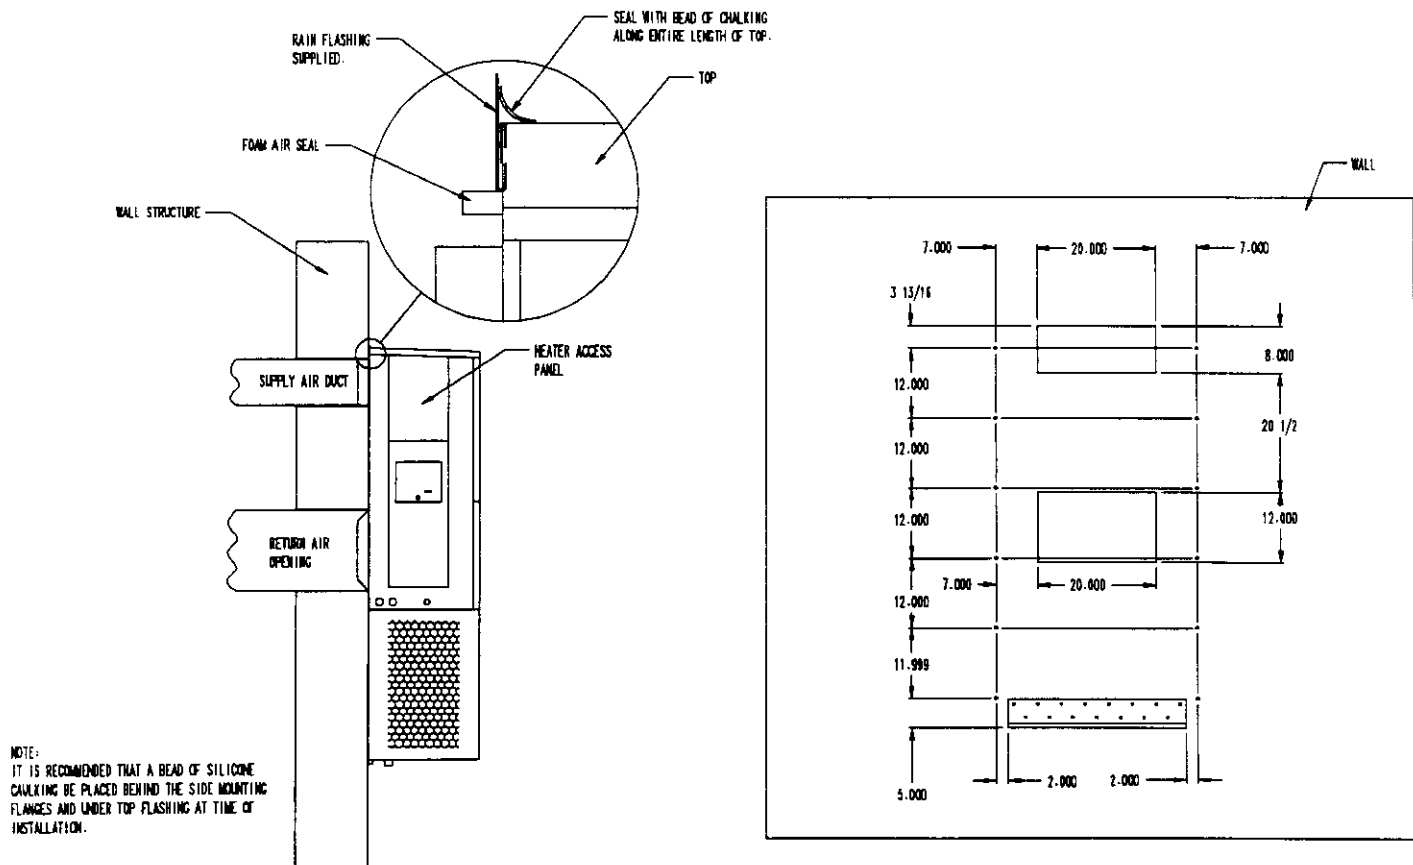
WALL-MOUNTING INSTRUCTIONS
